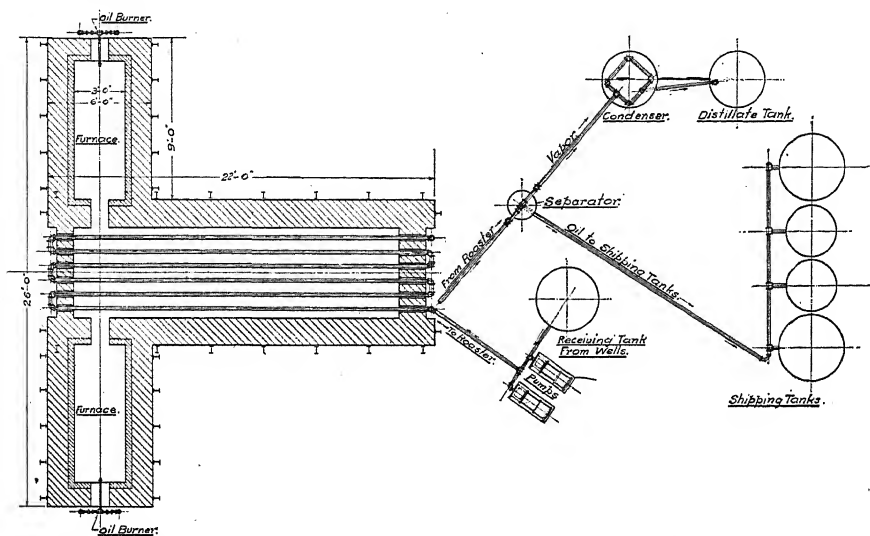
OIL-DEHYDRATING PLANT OF NEVADA PETROLEUM CO., COALINGA, CAL. PLAN.
